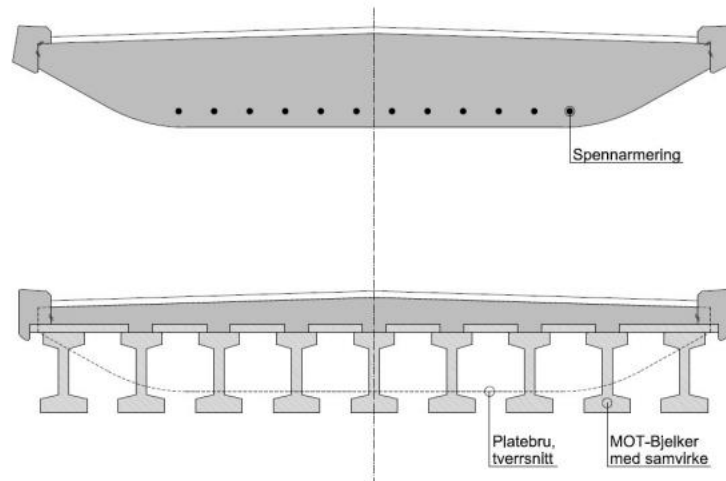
Cross section of in situ bridge and prefabricated beam bridge [55]
